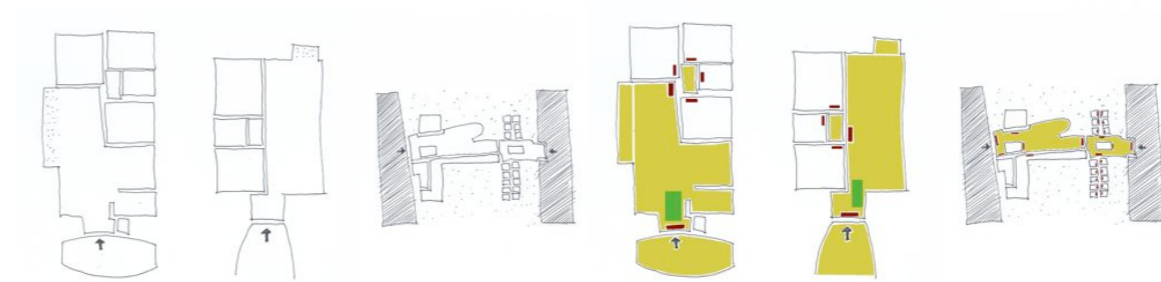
Residential project by Ove Arup & Berthold Lubetkin, London Highpoint, 1934-1935: adjacent territories and access configuration. (based on original plans of housing typologies and general floor plan)
